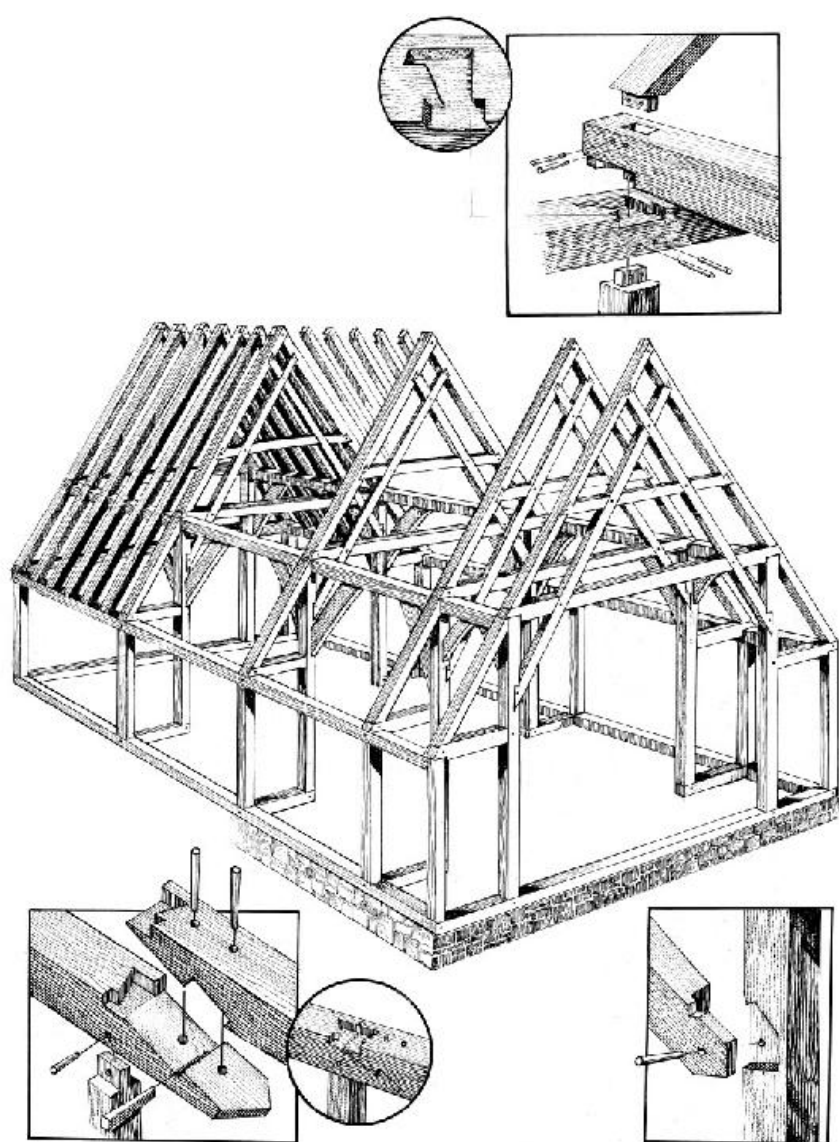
Axonometric reconstruction by Bryan Byron of the original framing and constructional details of the Cathedral Barn, based on the surviving structural evidence. It is now known that the medieval timbers were moved and re-erected on this site
